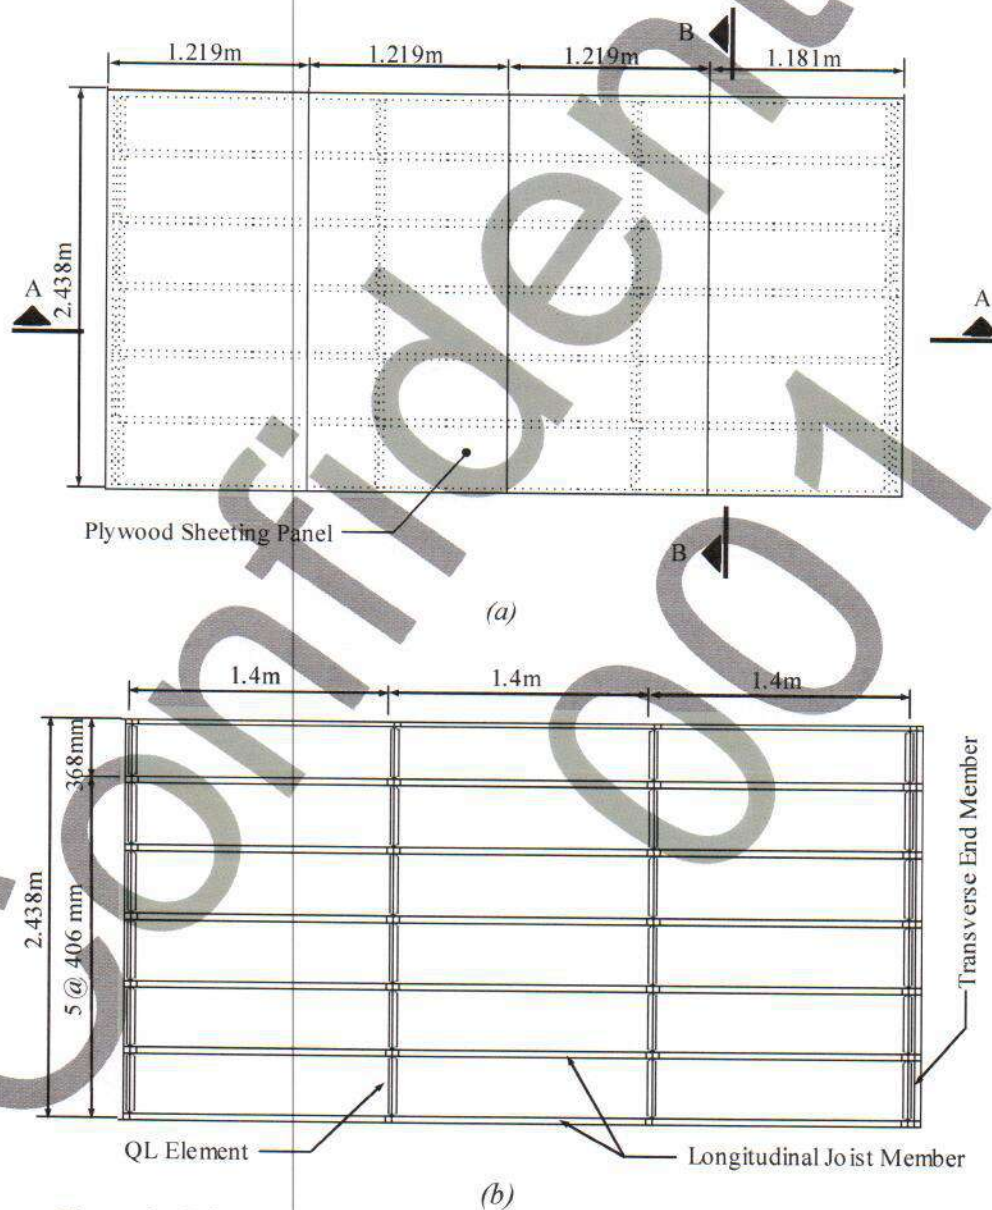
Schematic plan view of the specimens: a) Top view; b) Bottom view
